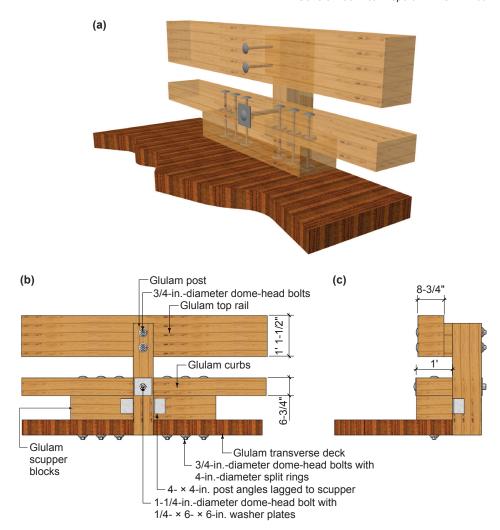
Glulam crash-tested railing option for transverse bridge decks meeting (NCHRP-350) test level 4 requirements: (a) perspective view; (b) outside profile view; (c) end view.
